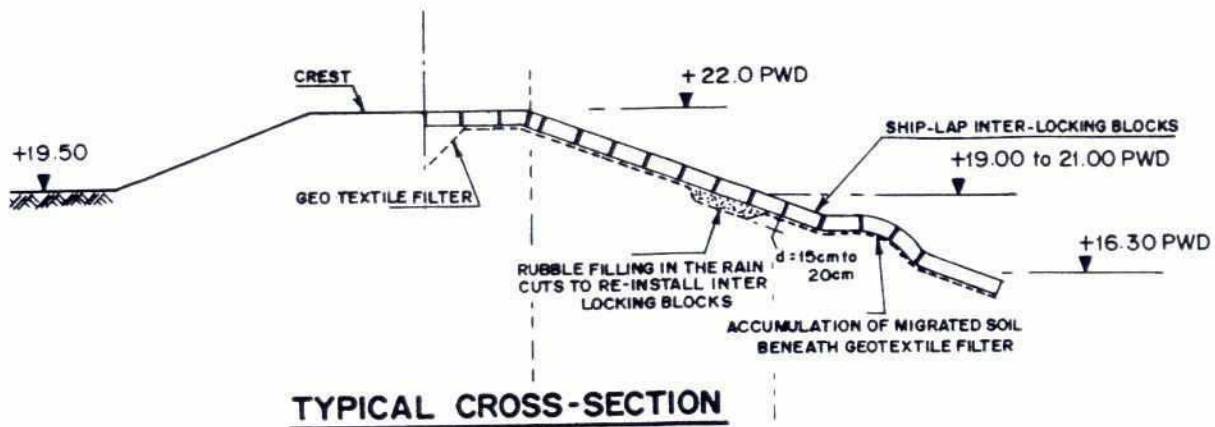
Rain cuts under layer of concrete slabs in Section E
